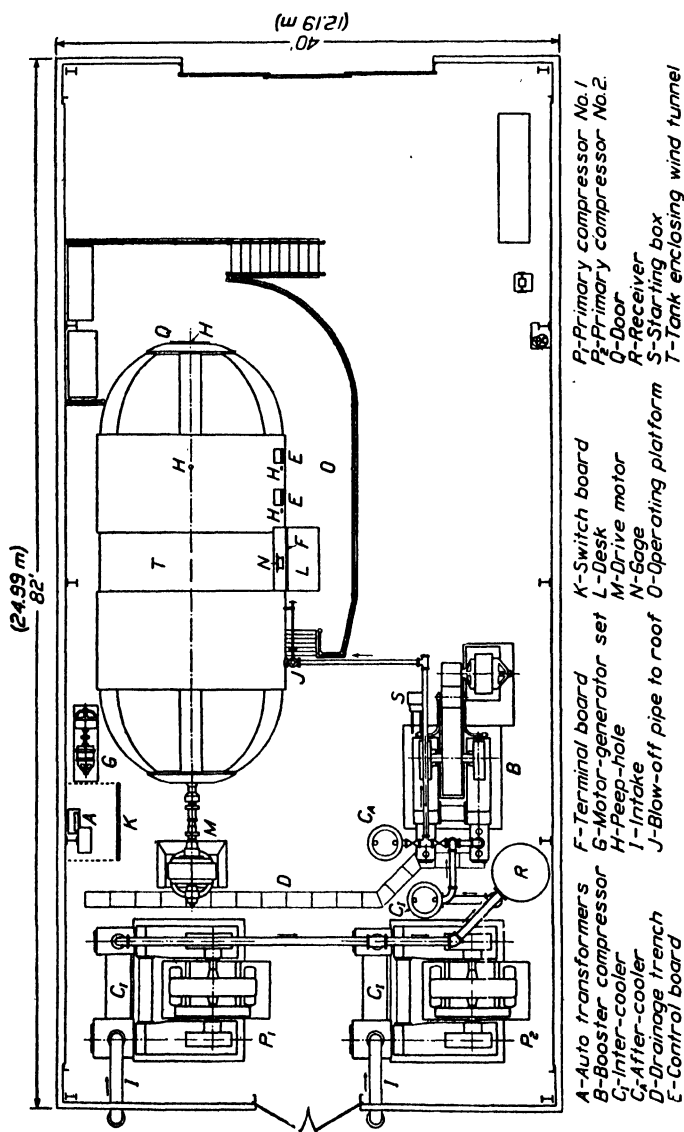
Floor plan of variable density wind tunnel and equipment.
